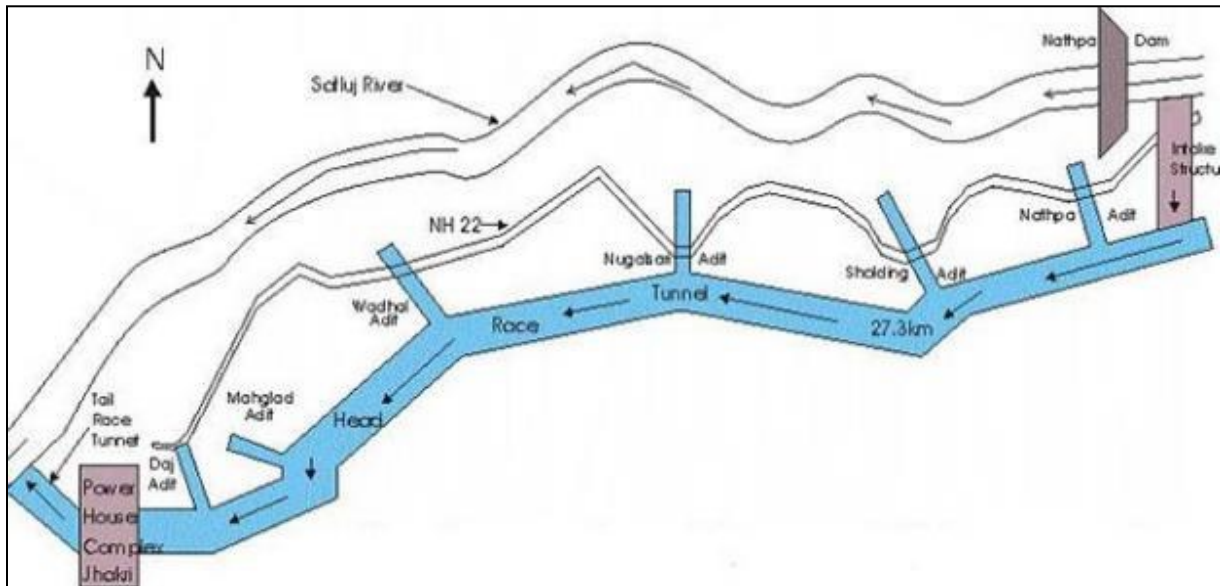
Layout of Nathpa Jhakri Hydro Power Station
